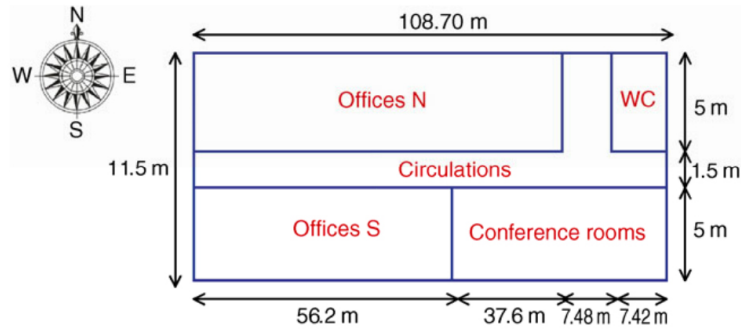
Office building floor geometry (Stabat *et al.*, 2011)
